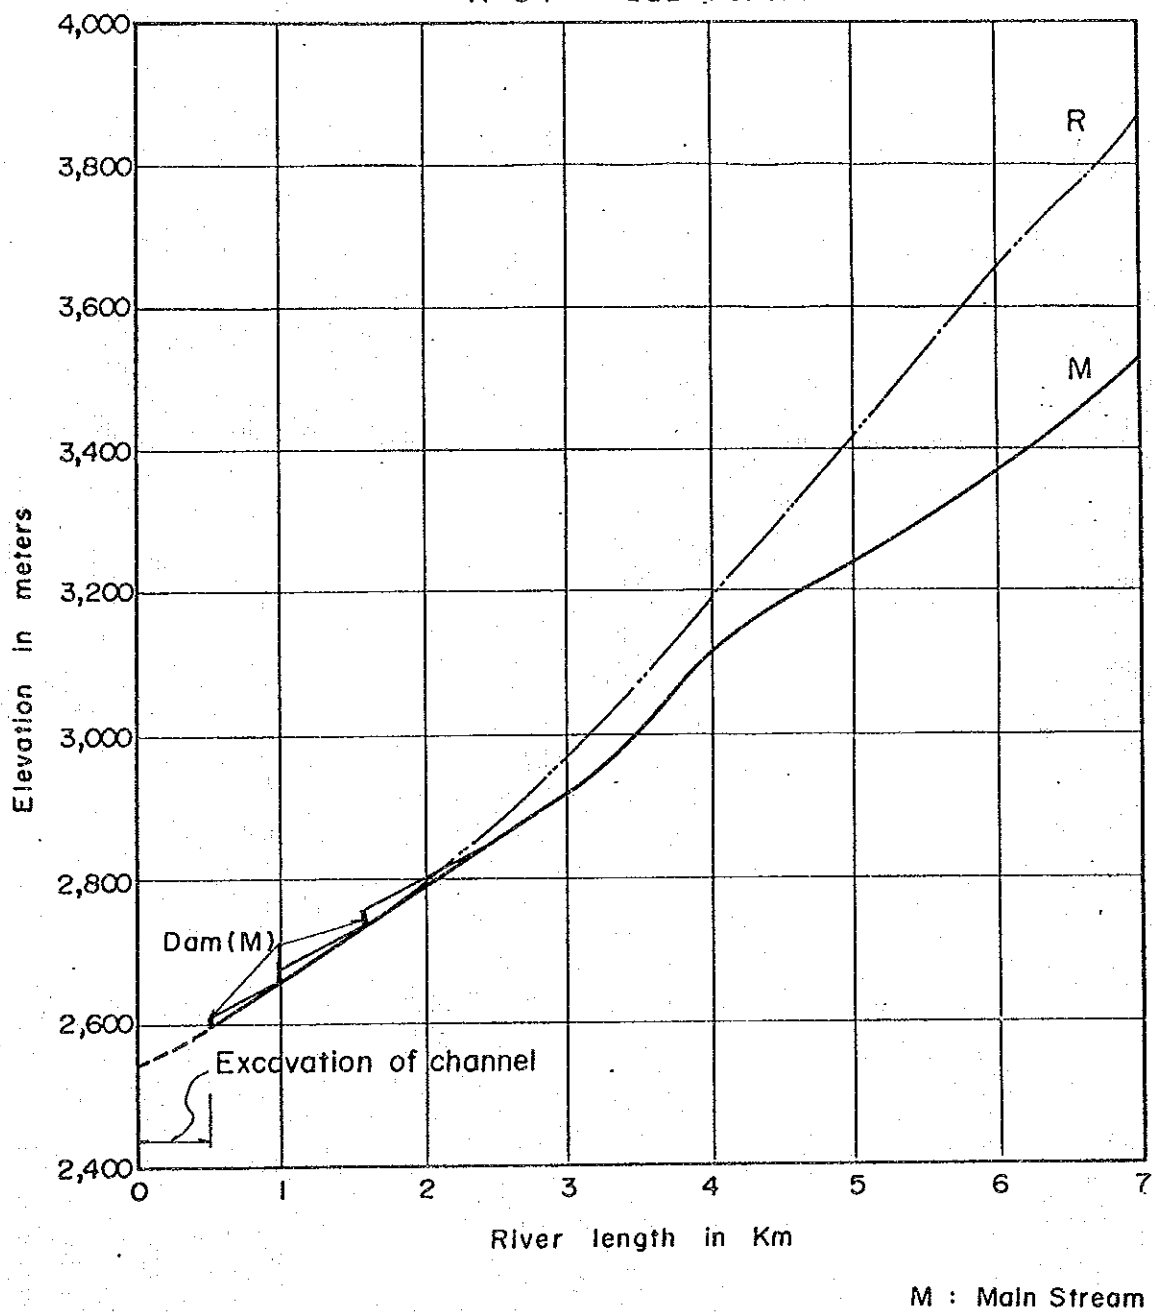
Structural Plan on Profile of Qda Pancha (R34)
